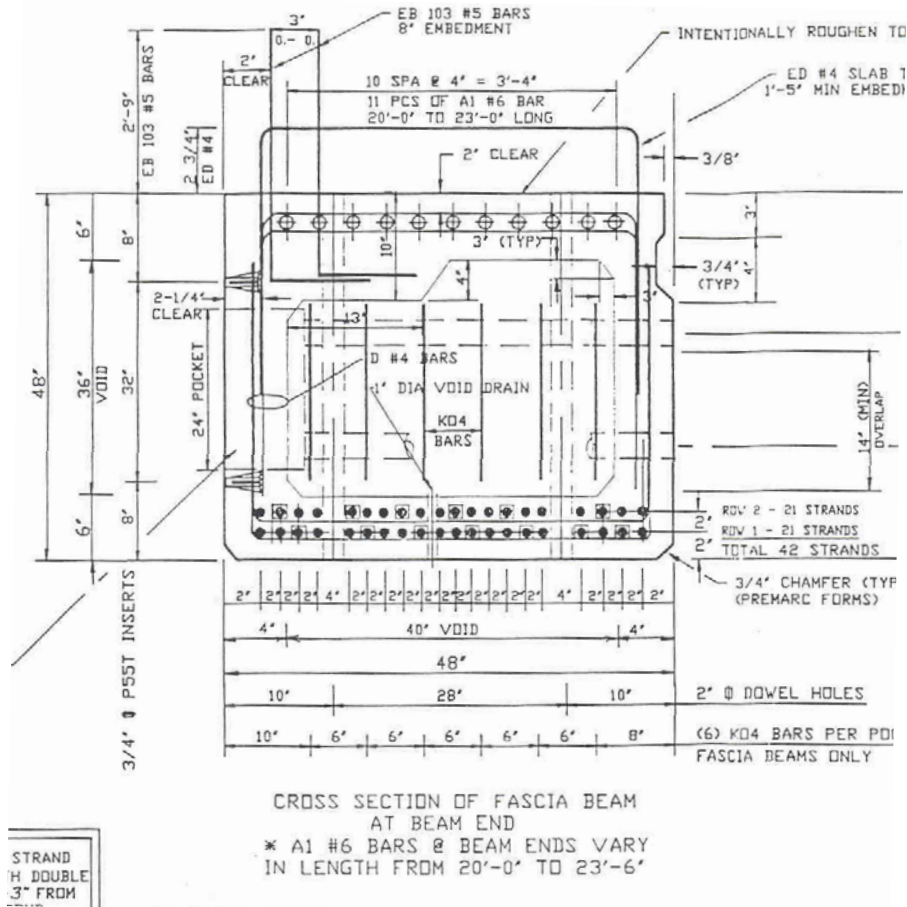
Cross Section of a Fascia Box Beam at Beam End.
